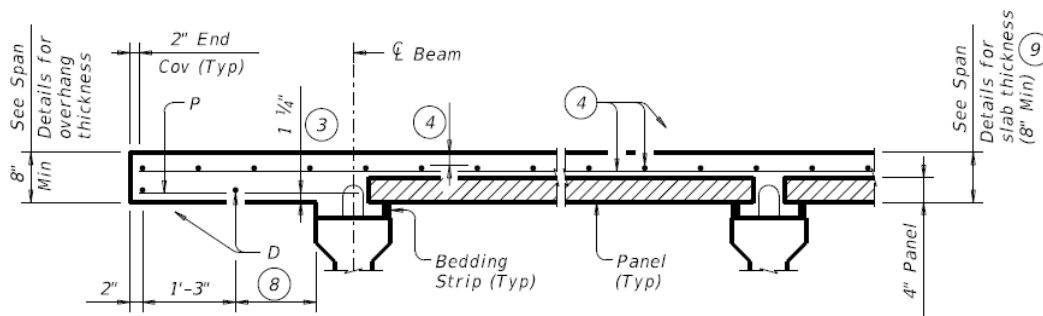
Standard design detail for CIP-PCP bridge deck on prestressed concrete I-beam (Reprinted from TxDOT Bridge Division Standards (2015))
